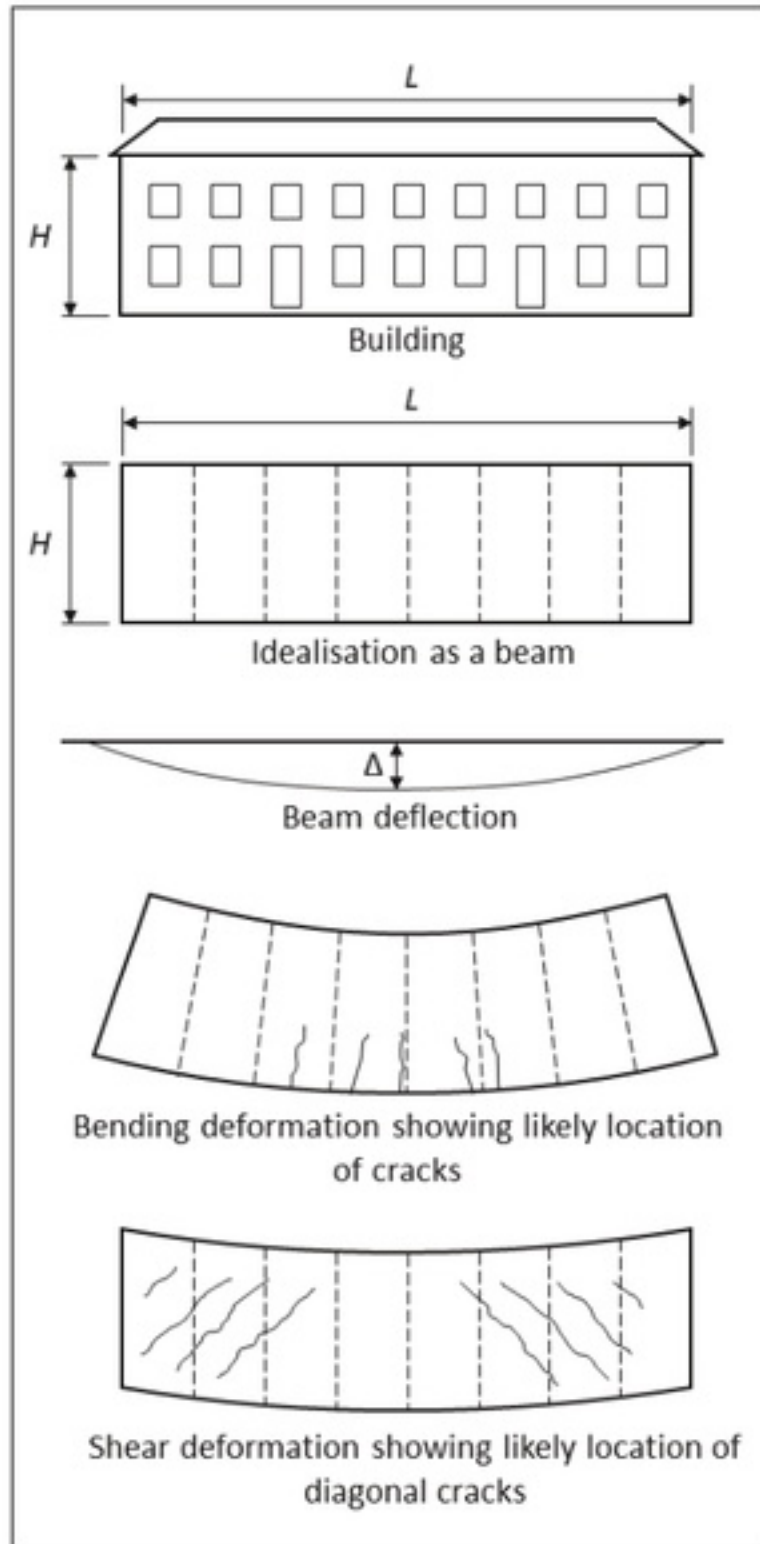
Idealisation of a bearing-wall building façade as a beam (Burland & Wroth, 1974).
